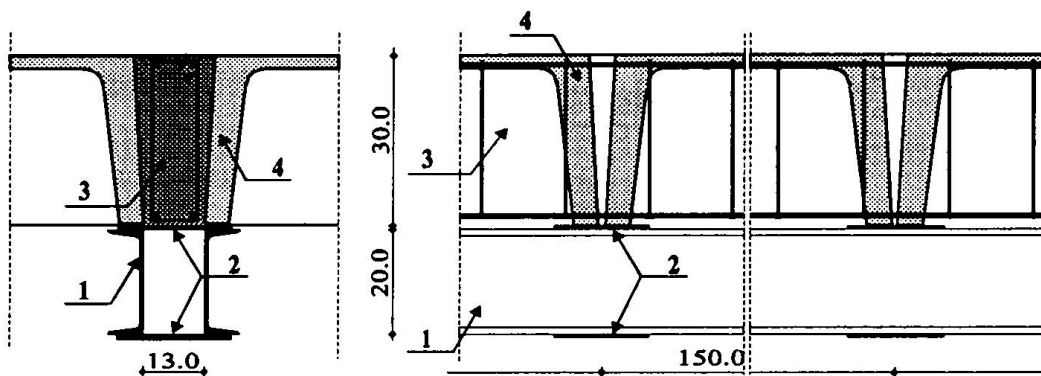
Composite section of a truss girder top flange: (1) - steel top flange of a girder, (2) - batten plates connecting branches of a girder flange, (3) - R/C curb, (4) - precast thin-walled reinforced concrete slabs 30x150x587 cm
